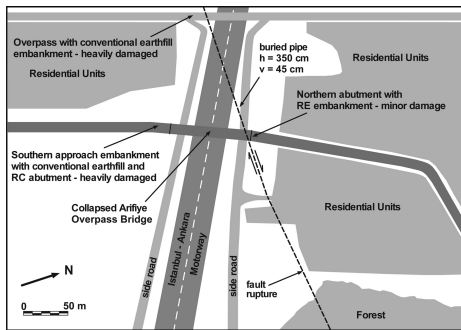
Plan view of Arifiye Overpass and the fault rupture.
